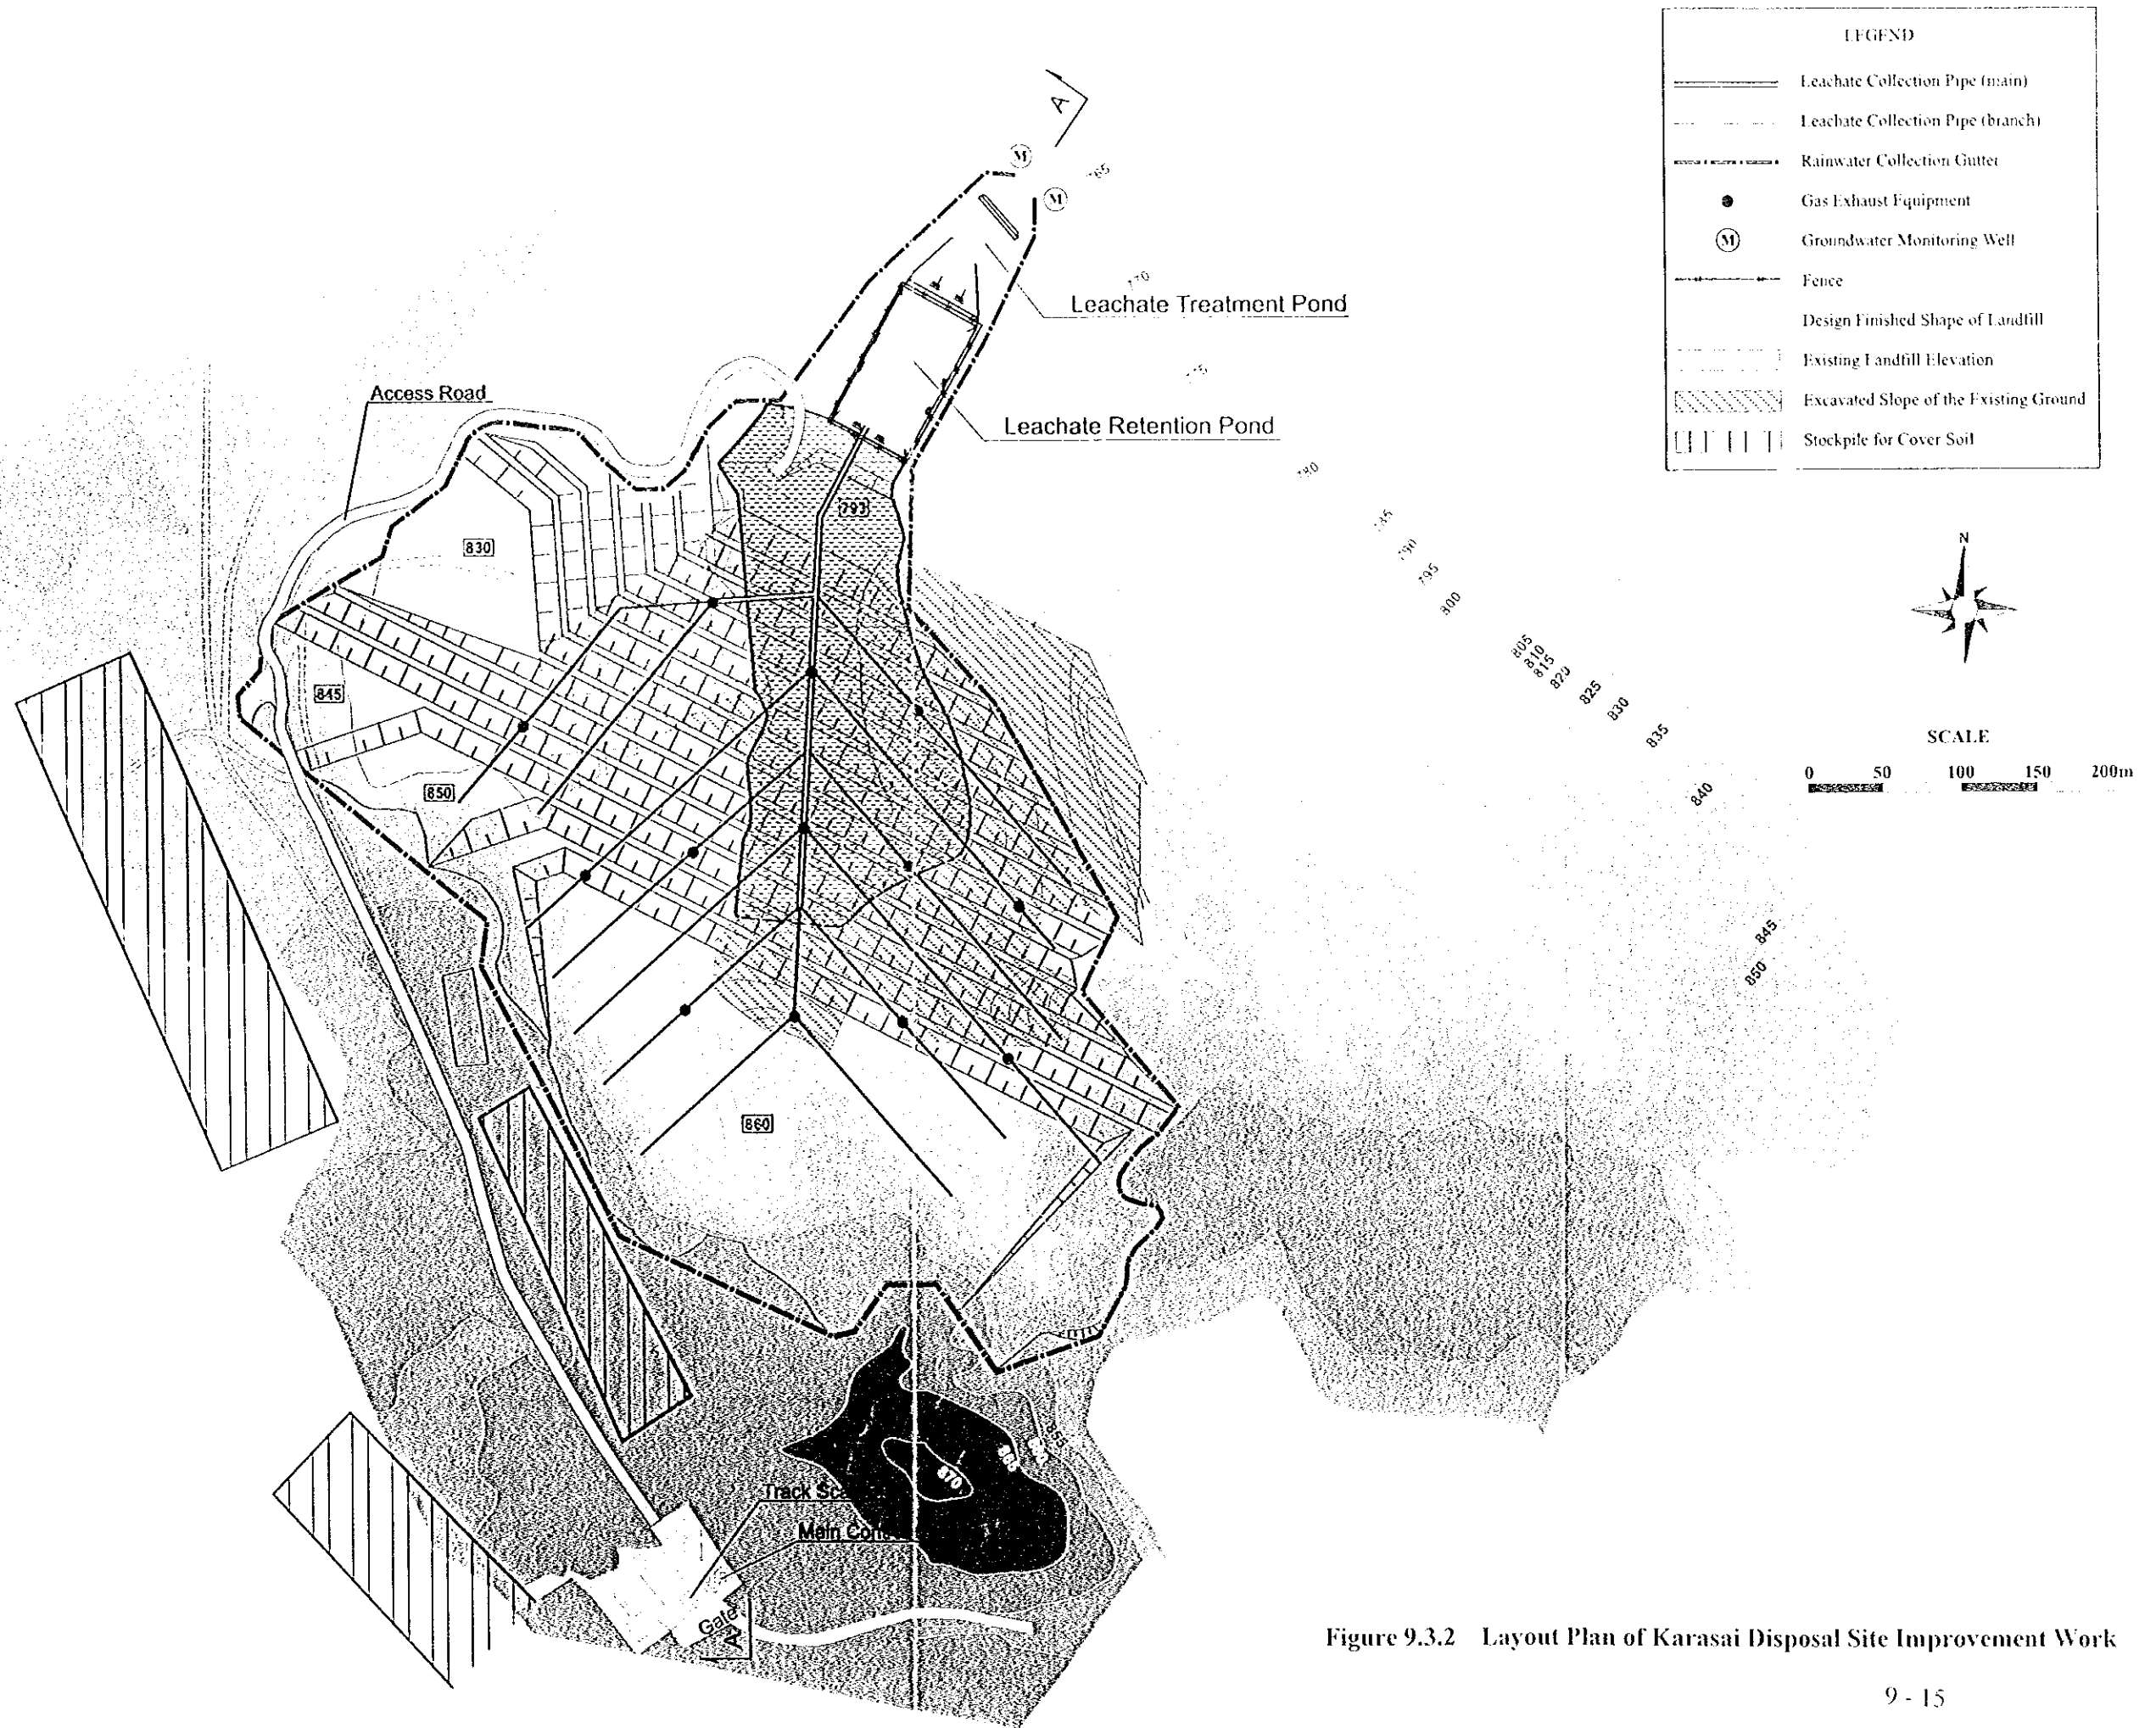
Layout Plan of Karasai Disposal Site Improvement Work
